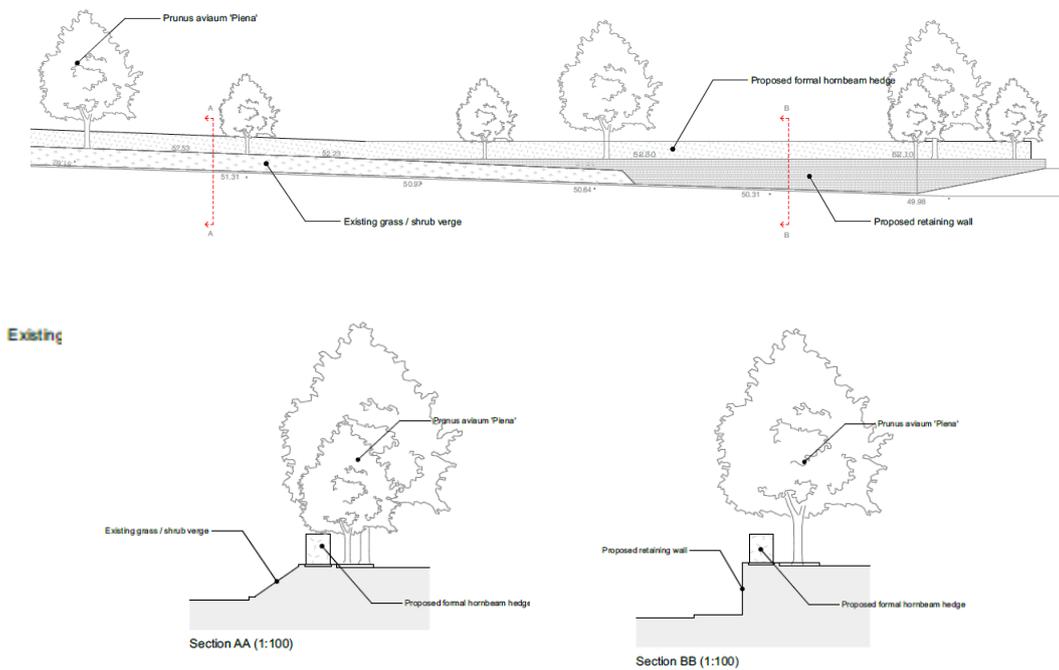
Northern Chart Road frontage showing the retaining wall view from Chart Road with sections
